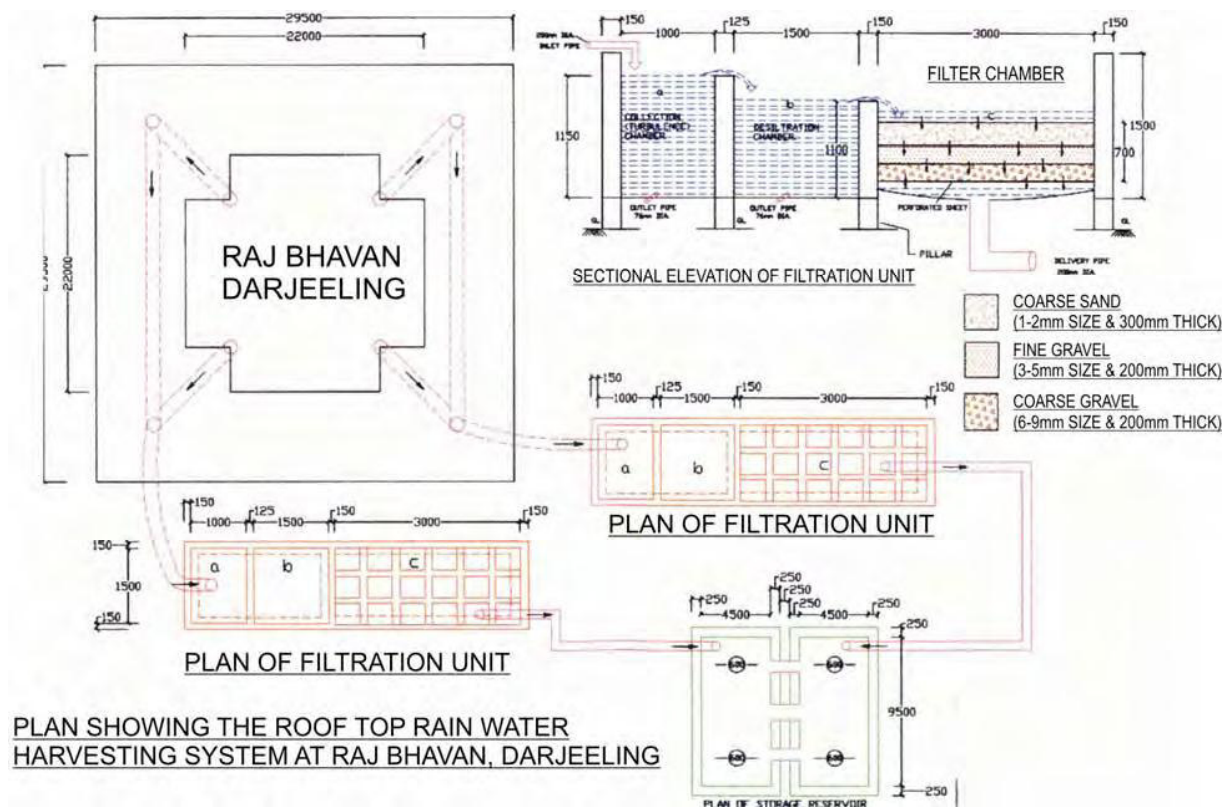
A schematic details of Rooftop rainwater harvesting at Rajbhawan, Darjeeling.
